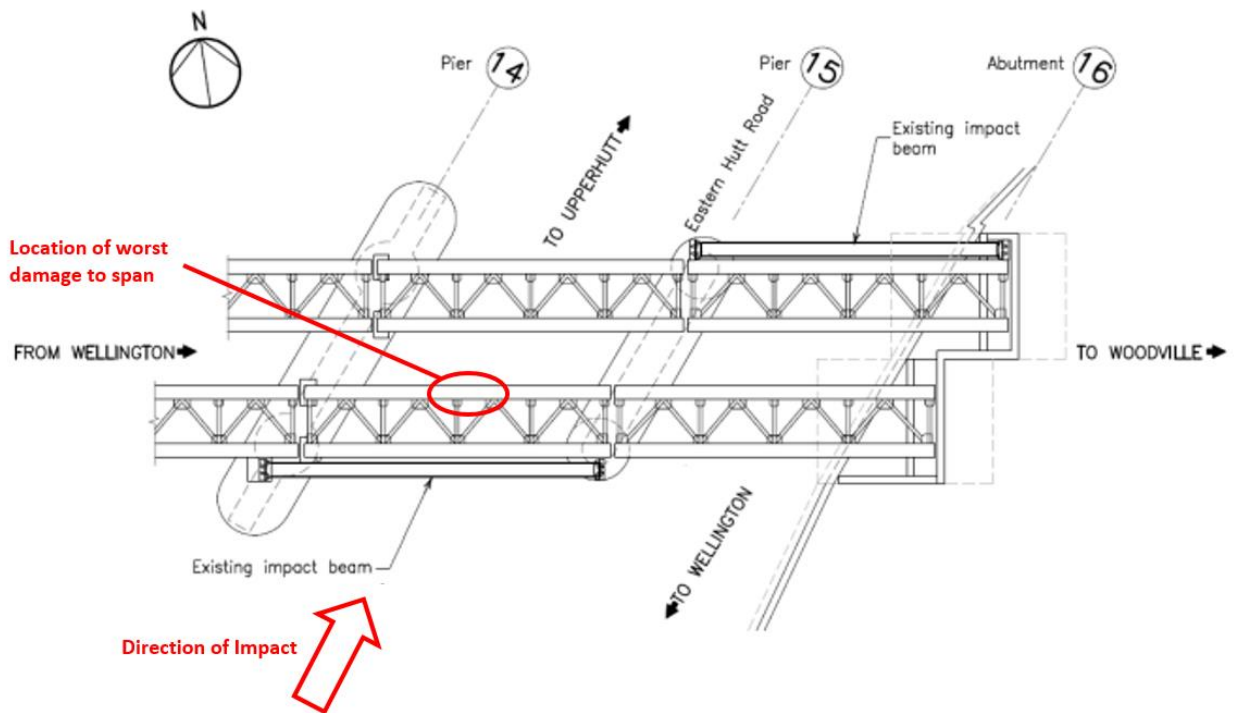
Plan view of the Br 30 WL spans over the road and the location of worst damage
